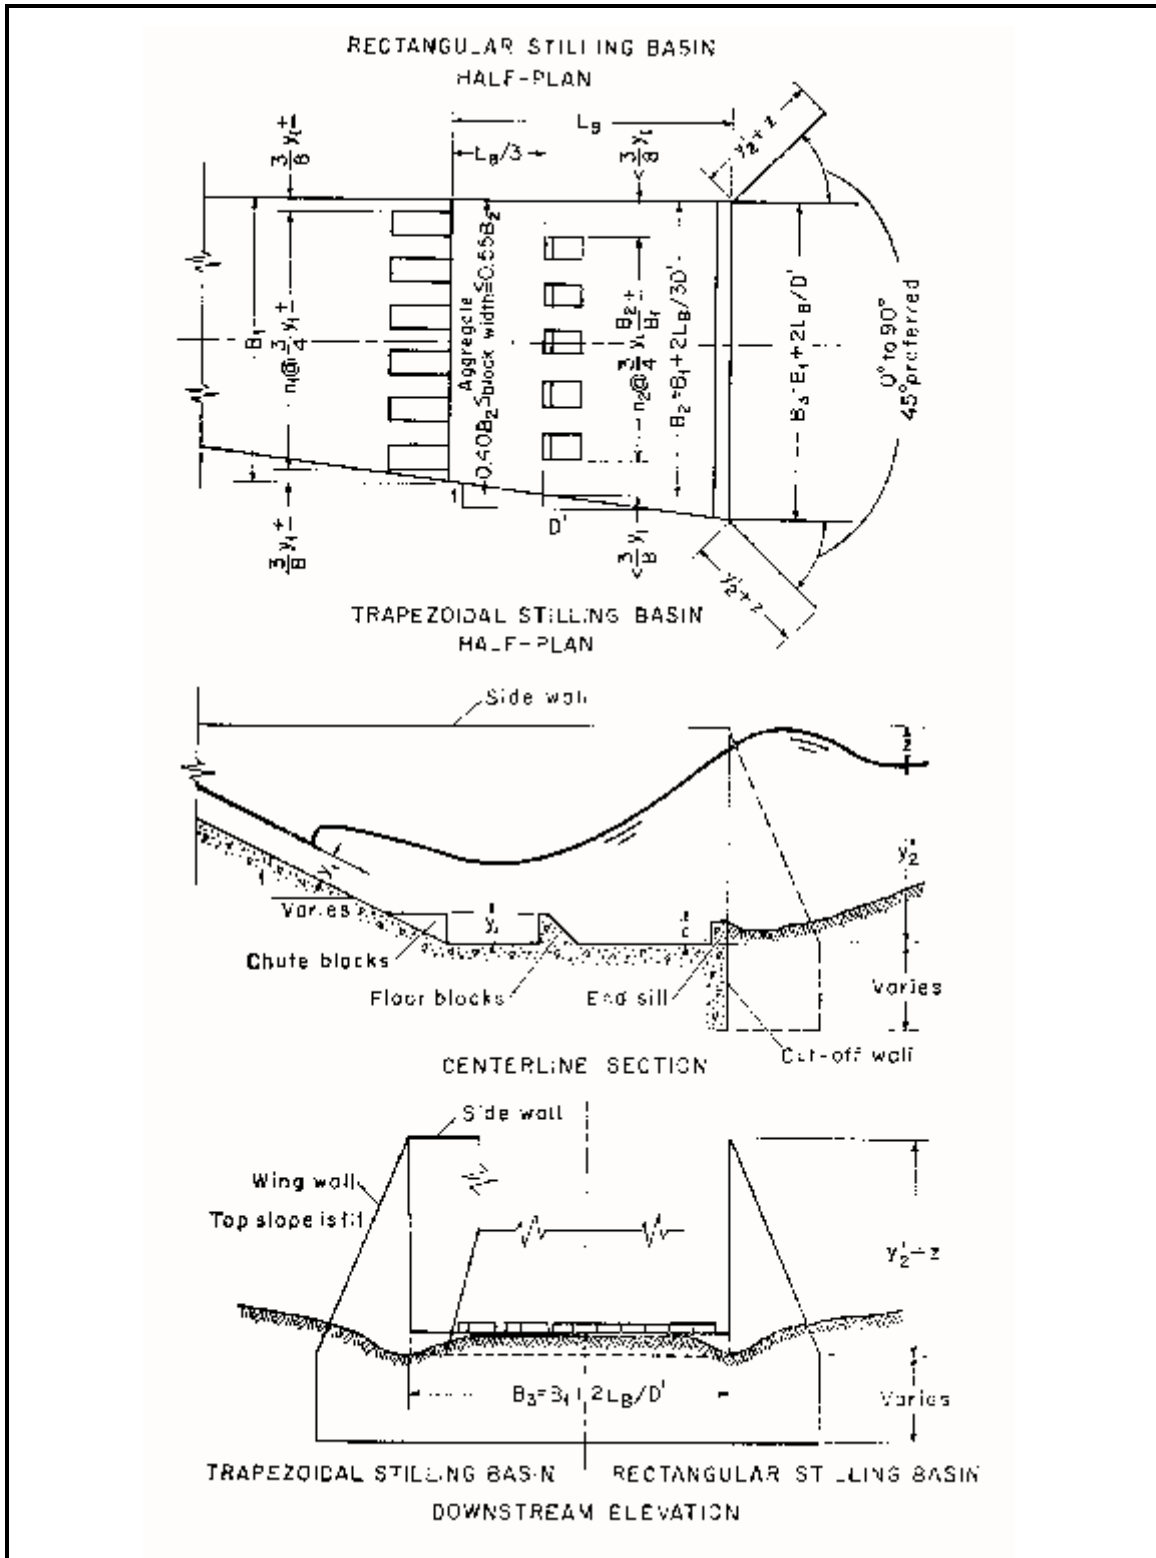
St. Anthony Falls (SAF) Type Drop Structure (Blaisdell, 1948)
